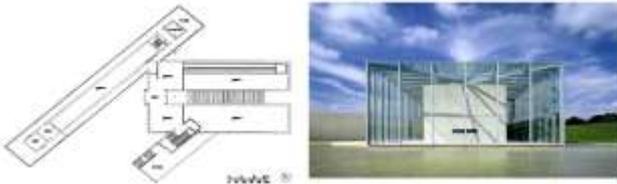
Tad Ando and Langen Neuss Foundation, Germany "2004" The building is designed with two parallel wings of concrete, six meters deep in the ground, the main entrance in concrete, and the glass envelope, supported by steel beams, around the concrete design where sunlight is through narrow skylight windows with adjustable slats.
